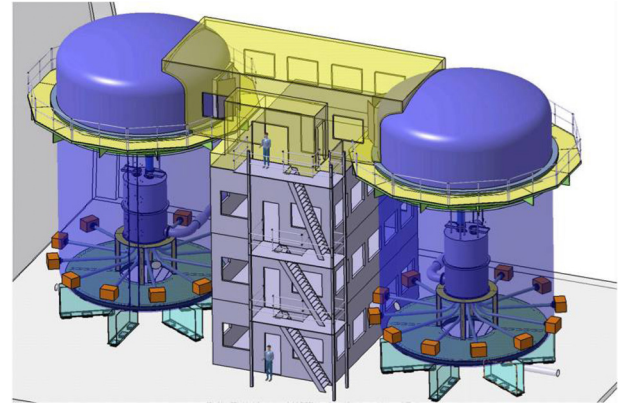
Original plan for the layout of two water tanks with the building, accommodating cleanrooms, control rooms and other infrastructure, placed between them.
